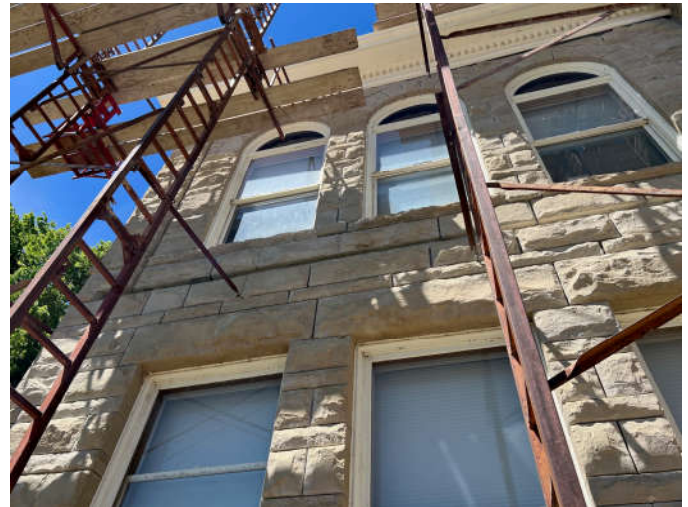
A replacement stone was laid between two second floor window sills. The new stones should align with the adjacent existing stones.
